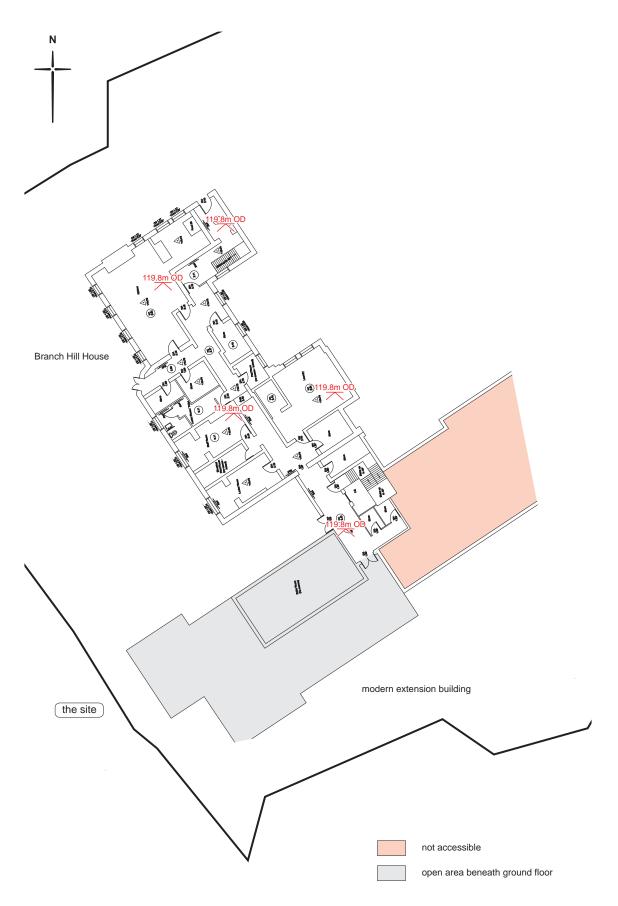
Existing basement plan (Merebrook Consulting, Job No. MER00520, Dwg. No. 002/002, April 2013)
